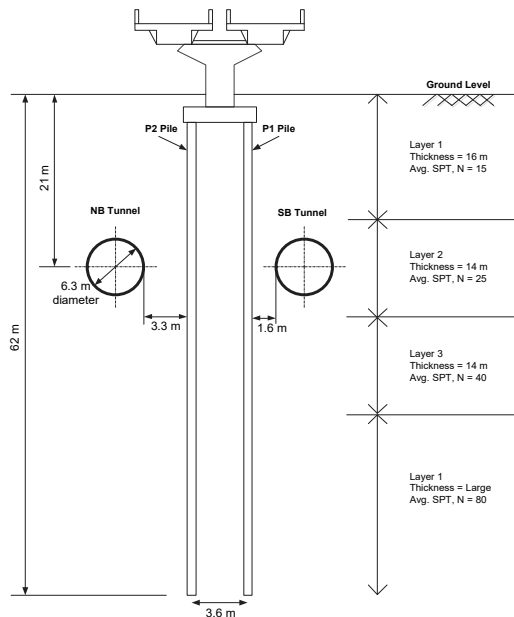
Piles and Tunnel Section at Pier 20 of Singapore MRT (Pang, 2006).
